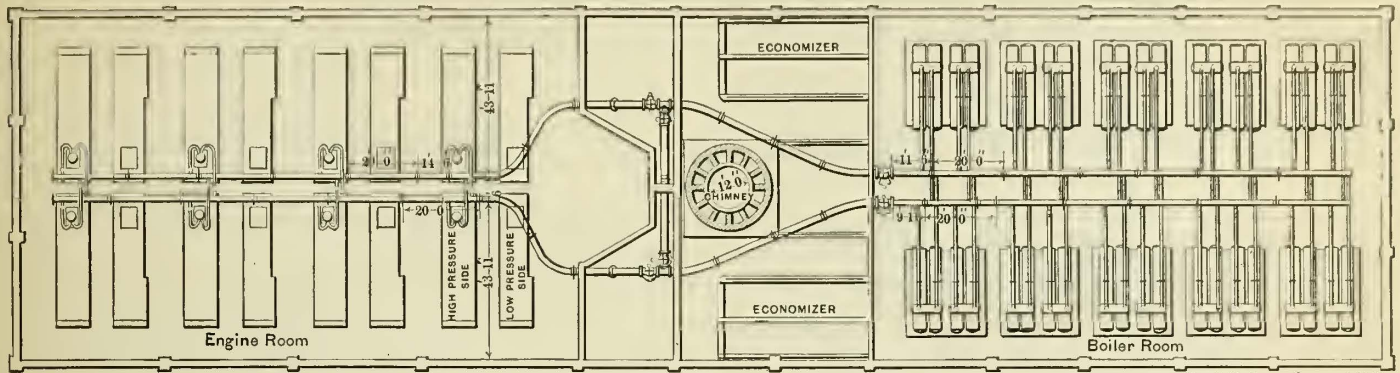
GENERAL PLAN OF STEAM PIPING—SOUTHERN POWER STATION, BROOKLYN CITY RAILWAY CO.
